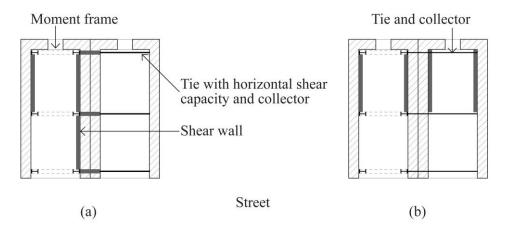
Plans of two adjacent idealized URM buildings showing moment frame retrofit structure in the transverse direction and shear walls in the longitudinal direction. In (a) transverse and longitudinal retrofit structure for both buildings is placed in just one building, and in (b) the longitudinal retrofit structure is evenly distributed in both buildings. Diaphragm and wall faceloading upgrade structure, essential for adequate performance, is not shown.
